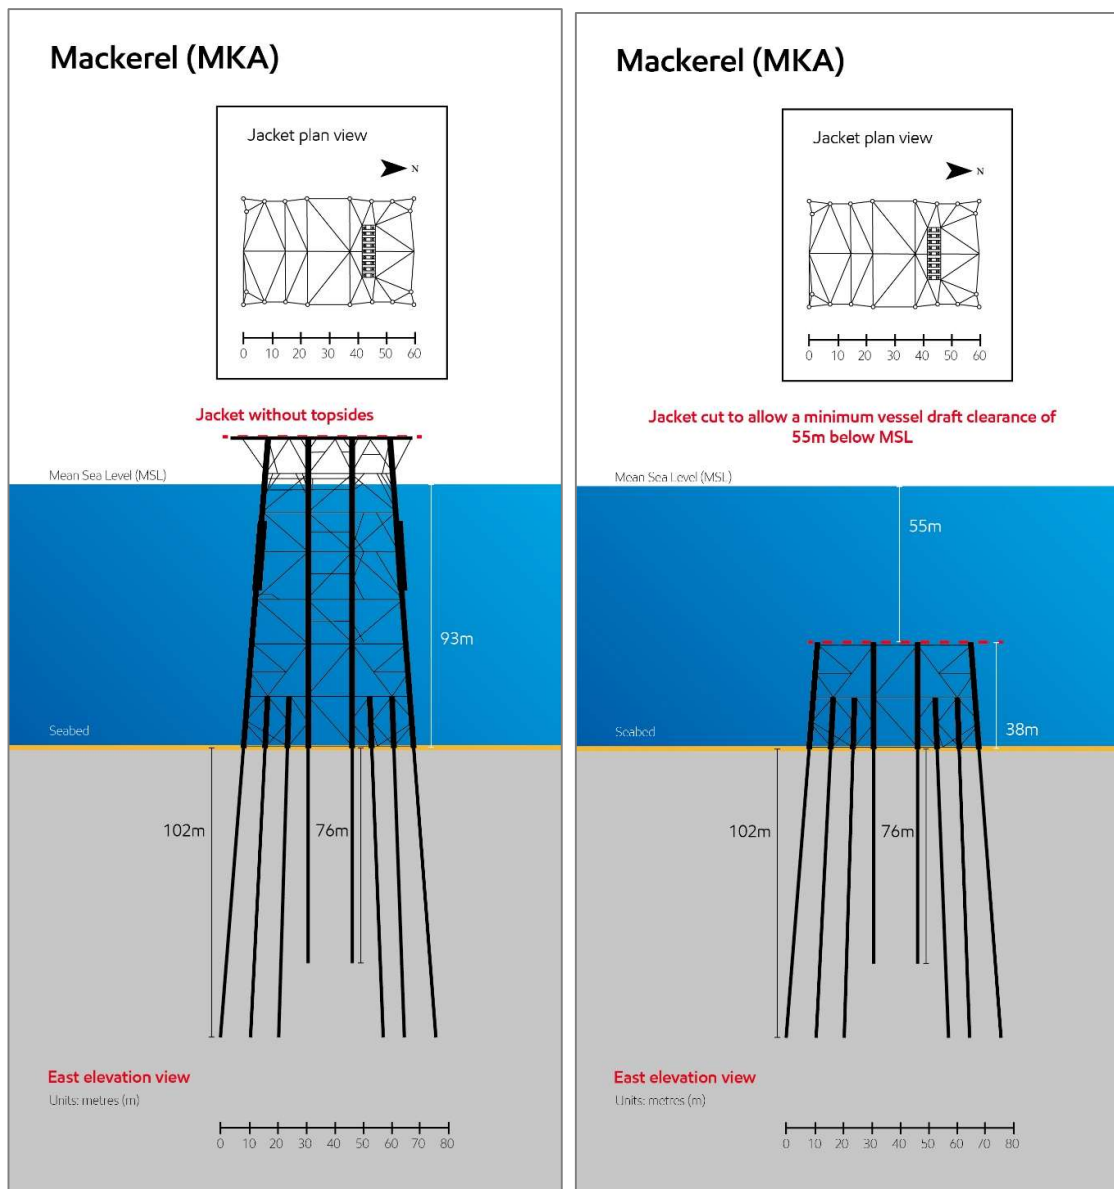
Mackerel Steel Piled Jacket without topsides (left) and under proposed end state (right)
